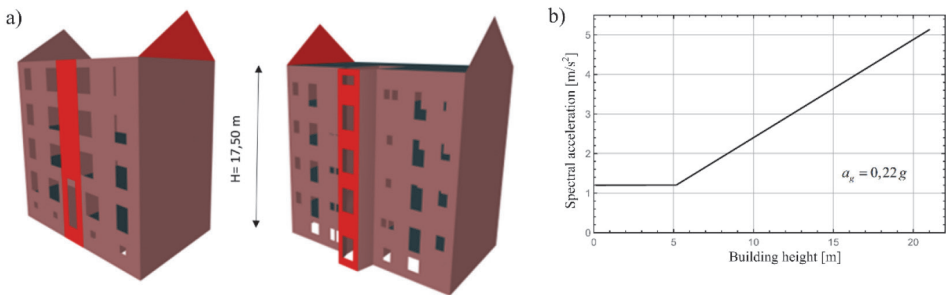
a) 3D view of the analyzed mechanism; b) Acceleration level requirement
